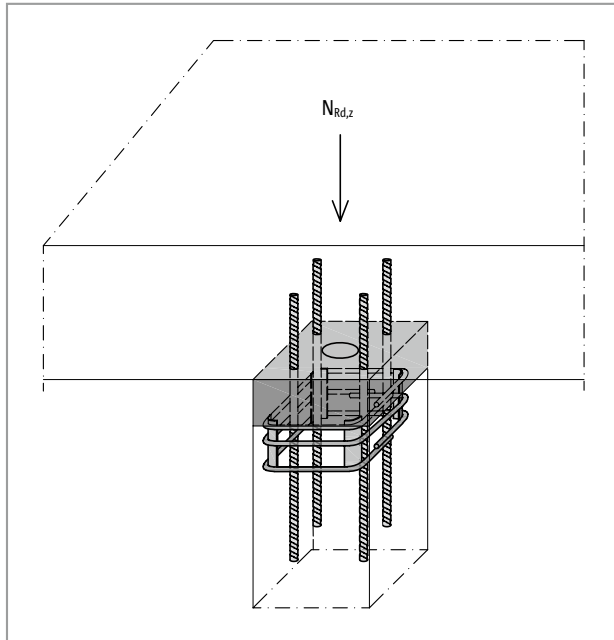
Schöck Sconnex® type P: Sign convention for the design
